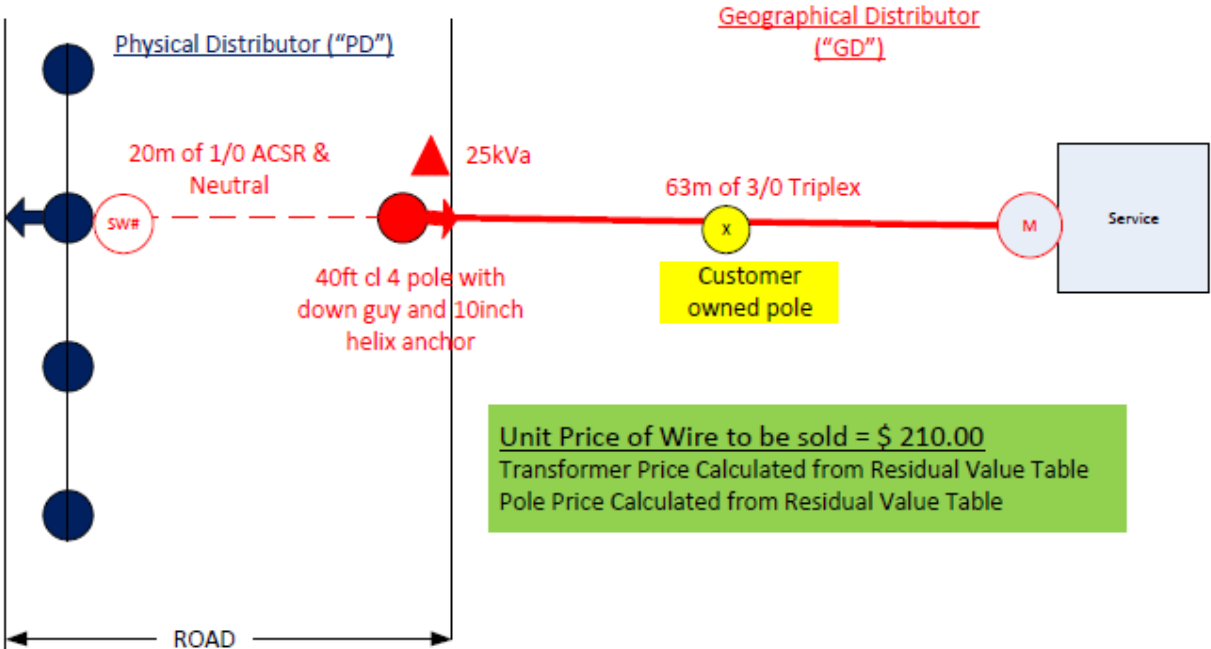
Primary “PD” supplied transformer, switch and Road crossing
